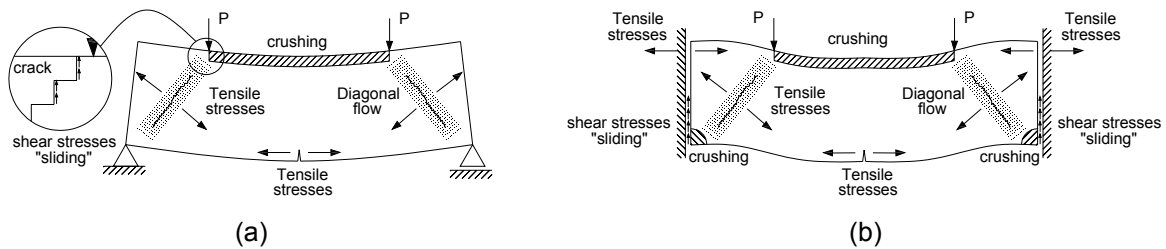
Possible crack patterns in masonry beams: (a) simply supported and (b) fixed end.
